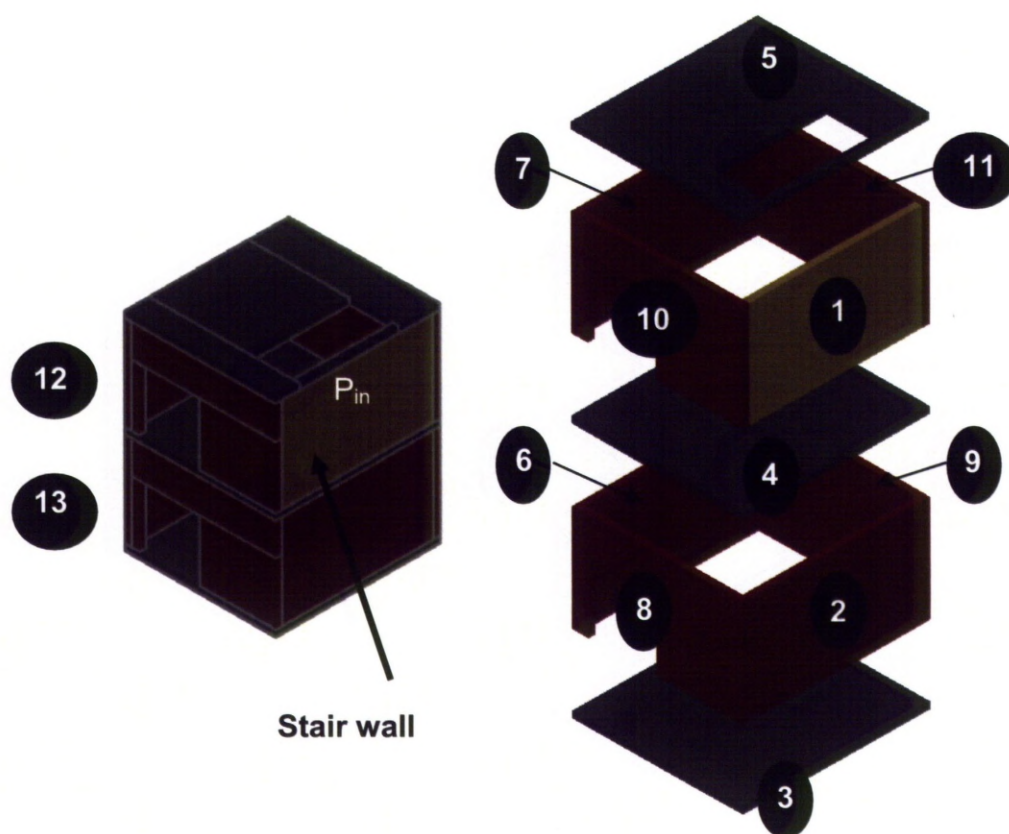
TSEA model of the staircase test facility with denotation of the subsystems (1 is the stair wall, 12 and 13 are rooms)
